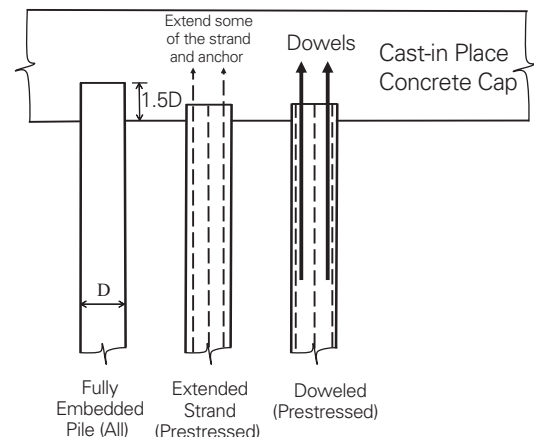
Some commonly used fixed pile-to-pile cap connection details.
